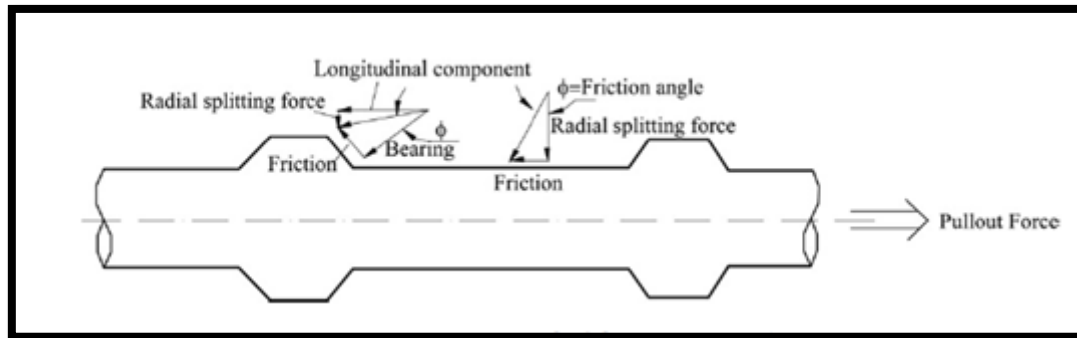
Bond mechanism for deformed reinforcing bars
